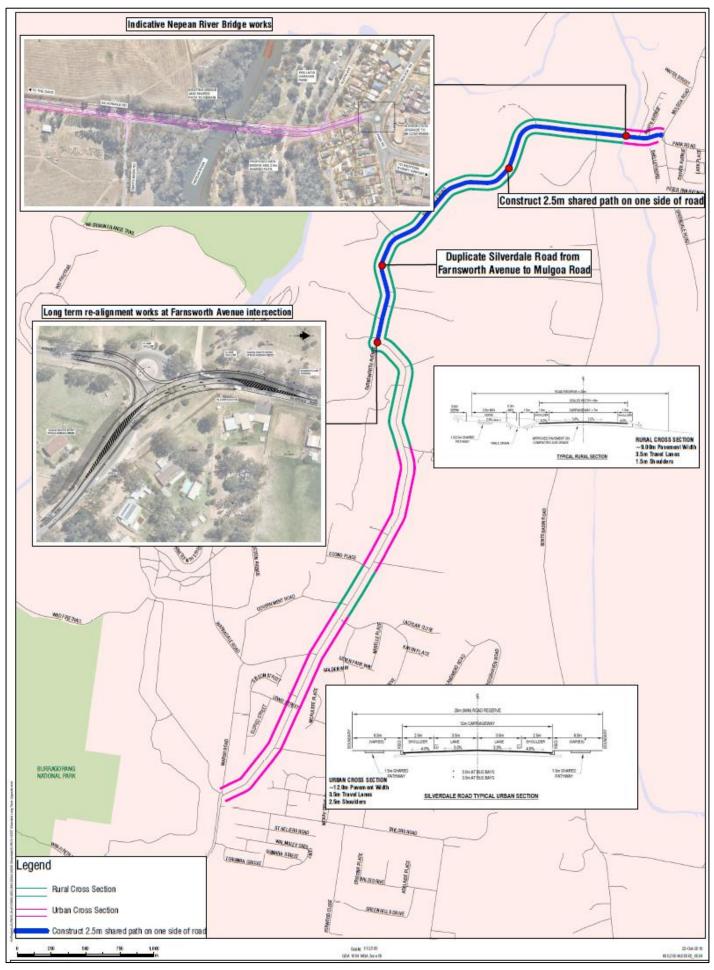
Silverdale Road Upgrade Concept Plan (Source: Wollondilly Shire Council)
